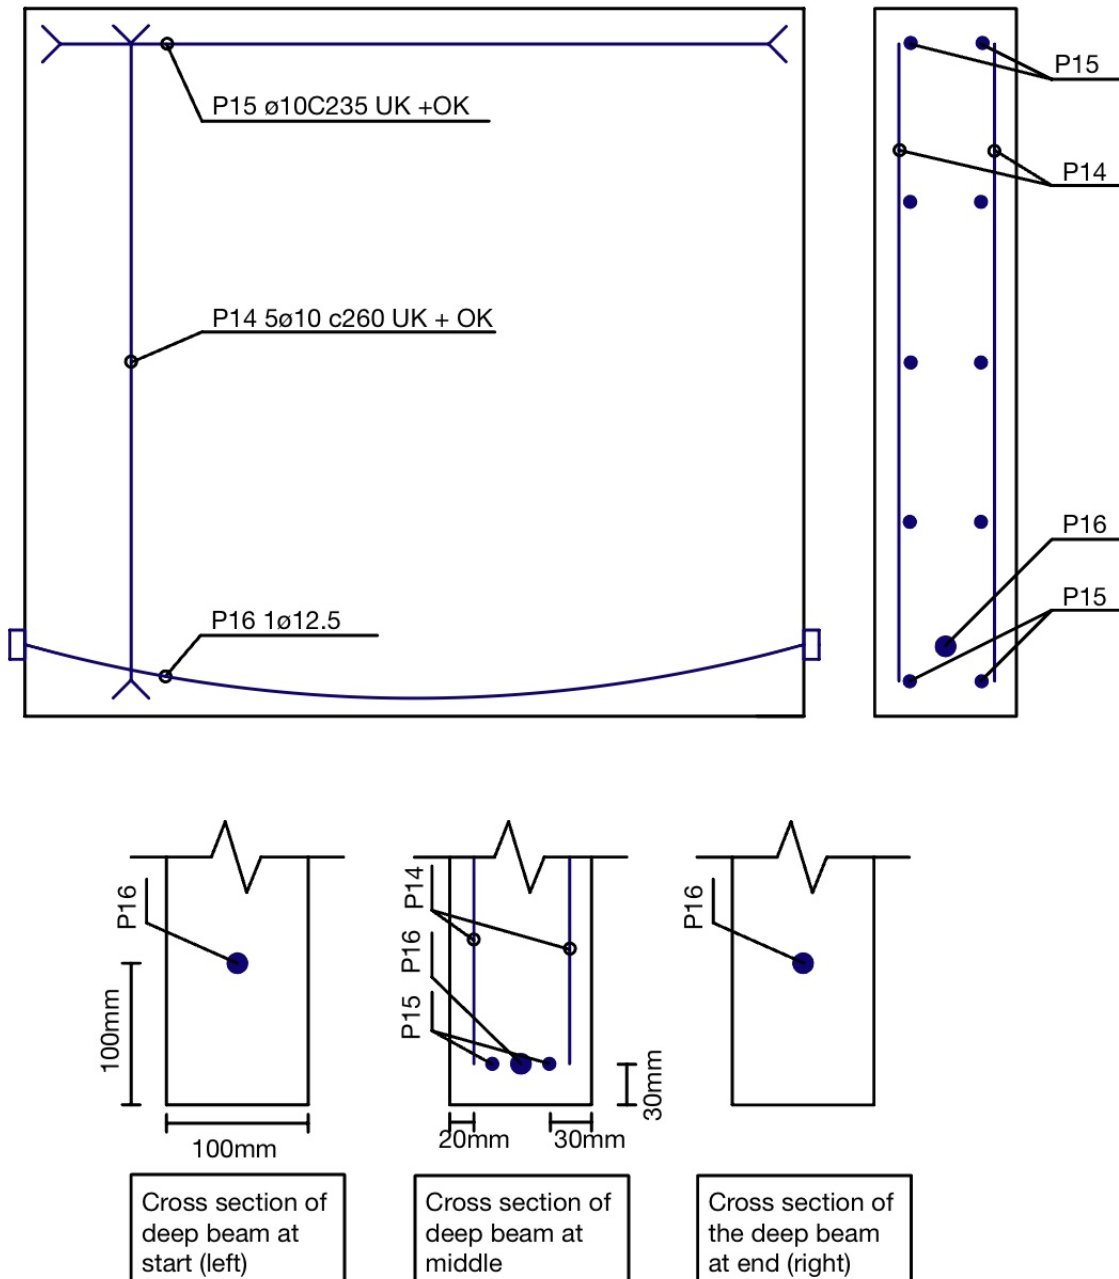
Reinforcement drawing of Model 1 with curved prestressed reinforcement
